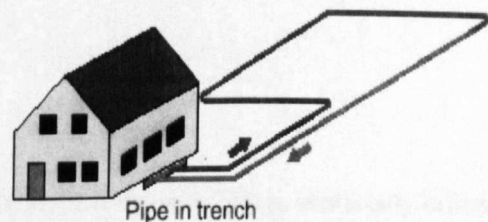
Horizontal ground heat exchanger (North European and American style)
